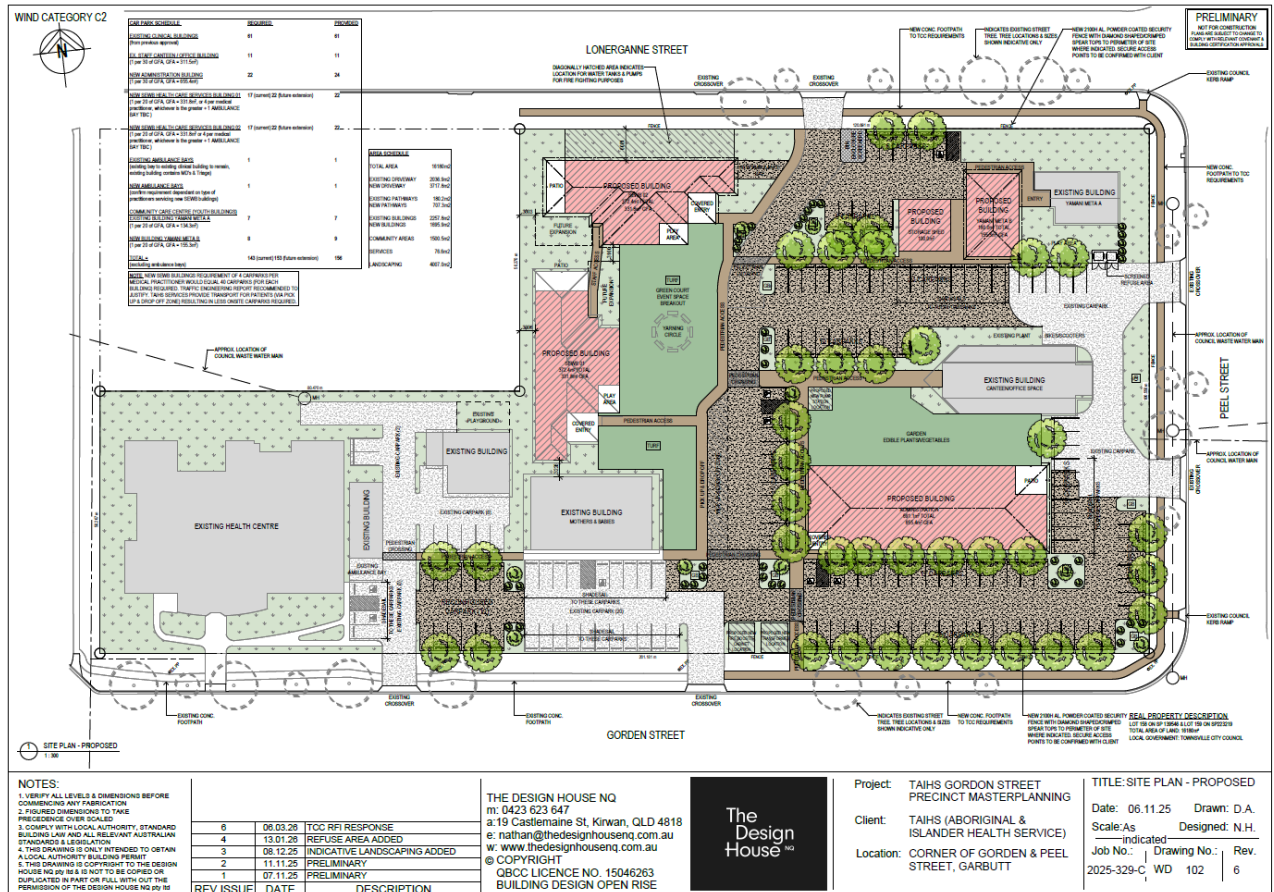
Townsville Aboriginal & Islander Health Service Redevelopment Plan
